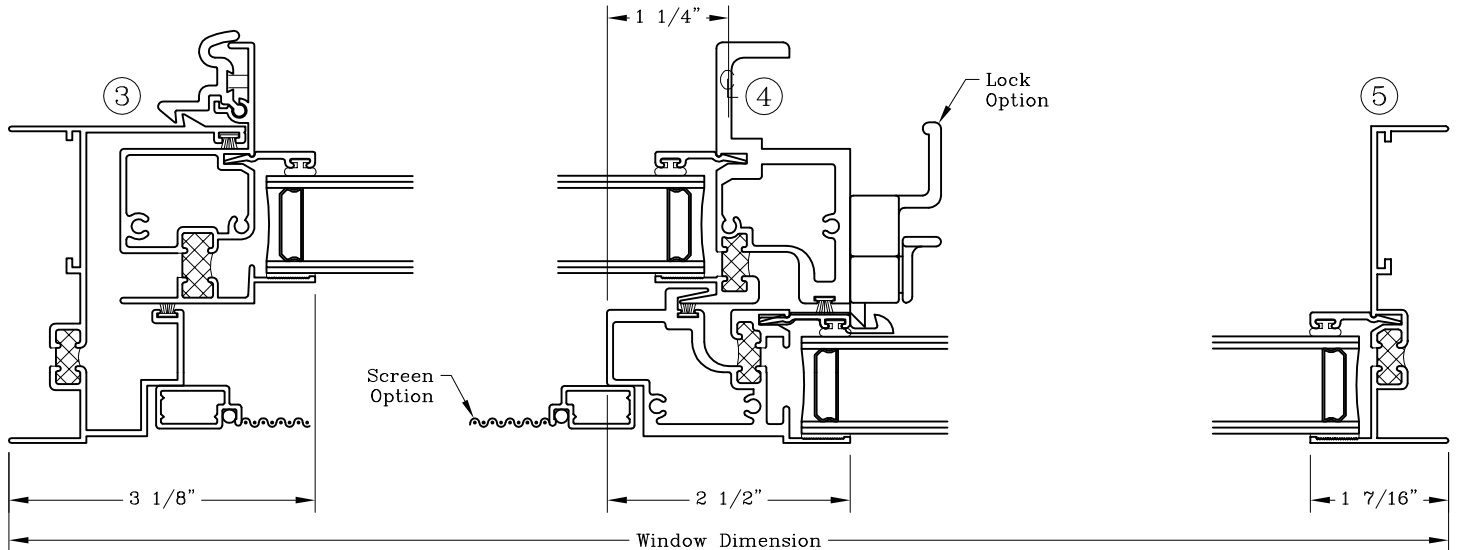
/2 Scale - For Custom Size Drawing Contact Graham
